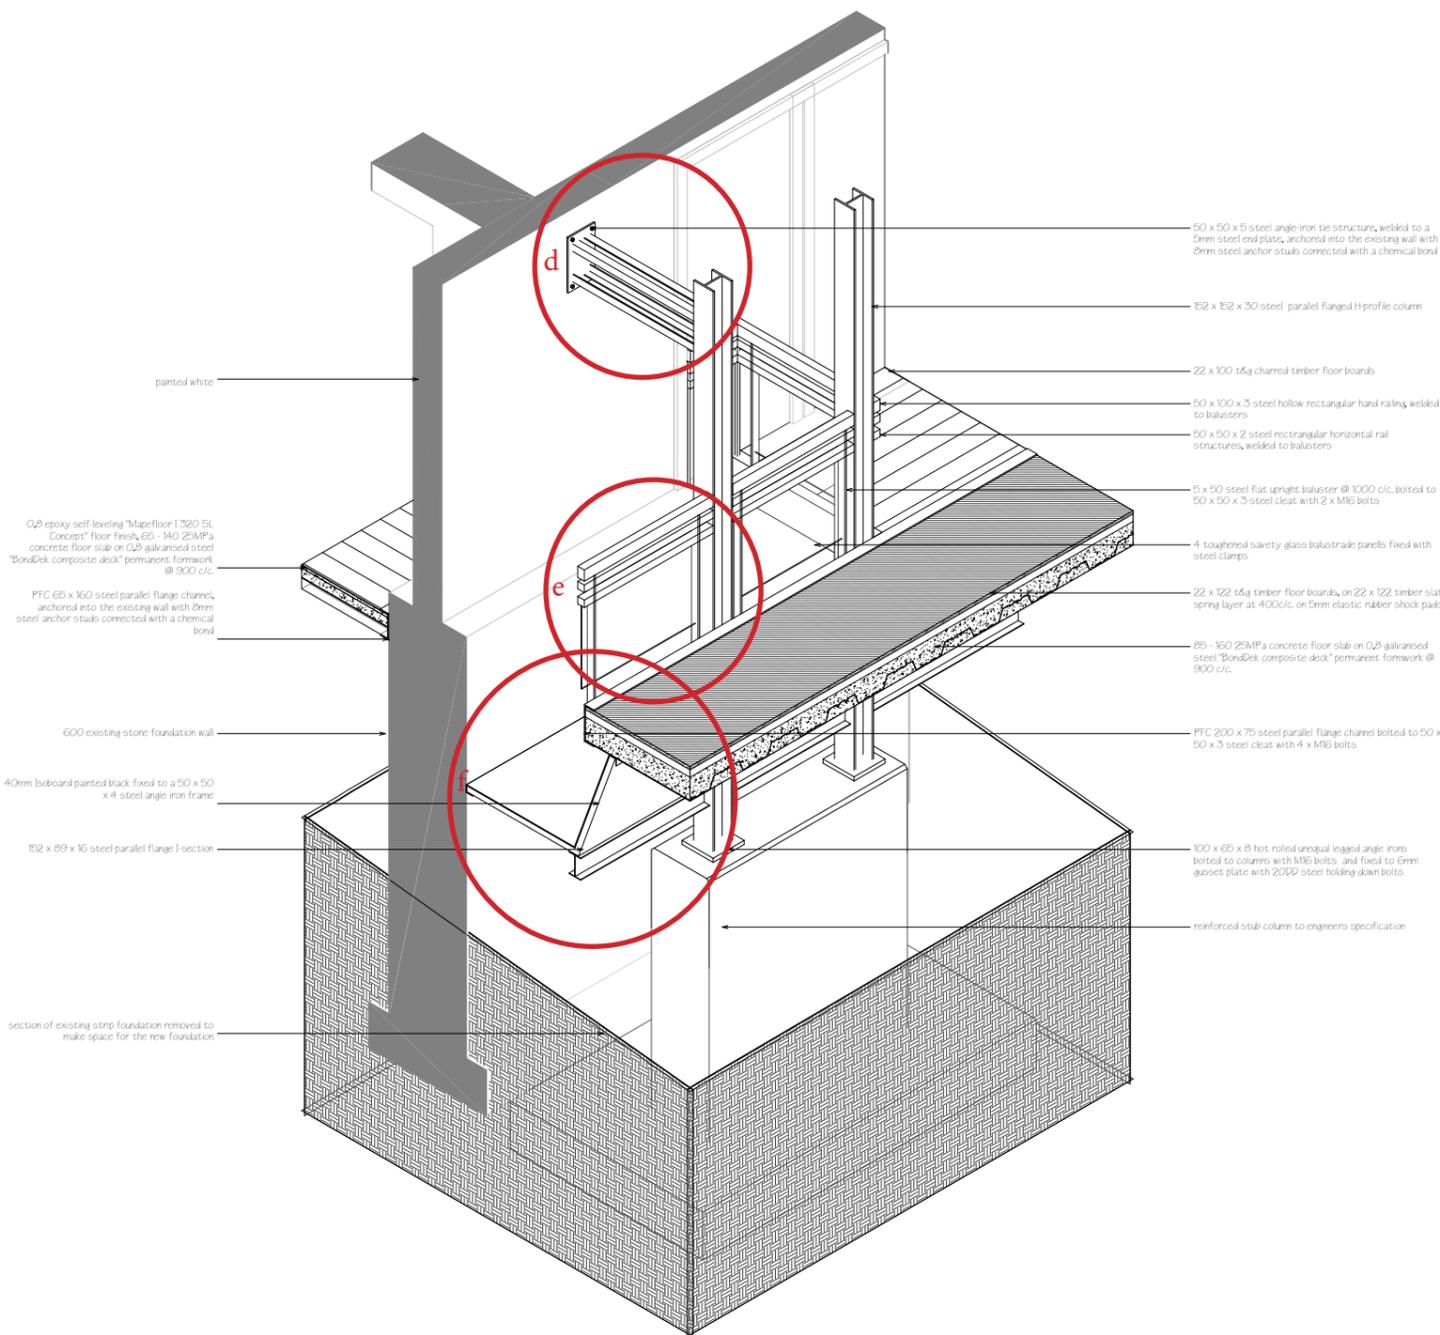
Detail 1: foundation and floor detail of basketball floor and old passage (Author October 2013)
